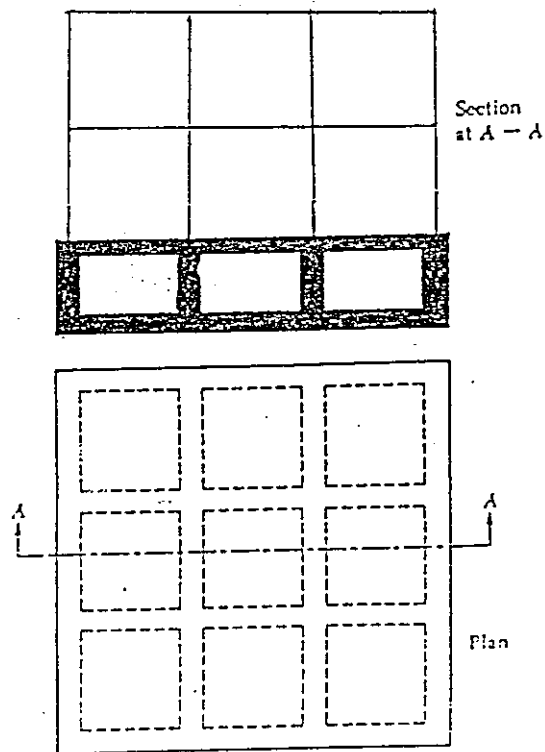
Slab with basement walls (after Das, 1990)
